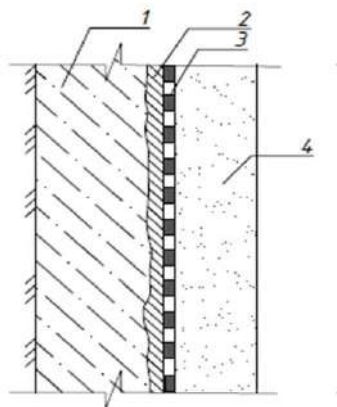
Monolithic wall structure, erected without hollows for backfilling the soil, with external waterproofing with double-sided adhesion: 1 – a diaphragm wall (enclosure of the excavation); 2 – levelling layer (reinforced fine-grained concrete, monolithic reinforced concrete); 3 – sprayed seamless waterproofing made of thermoplastic elastomer 6-8 mm with a front layer of 2 mm reinforced with geotextile cloth; 4 – tunnel lining wall made of monolithic reinforced concrete, erected without hollows for backfilling the soil.
